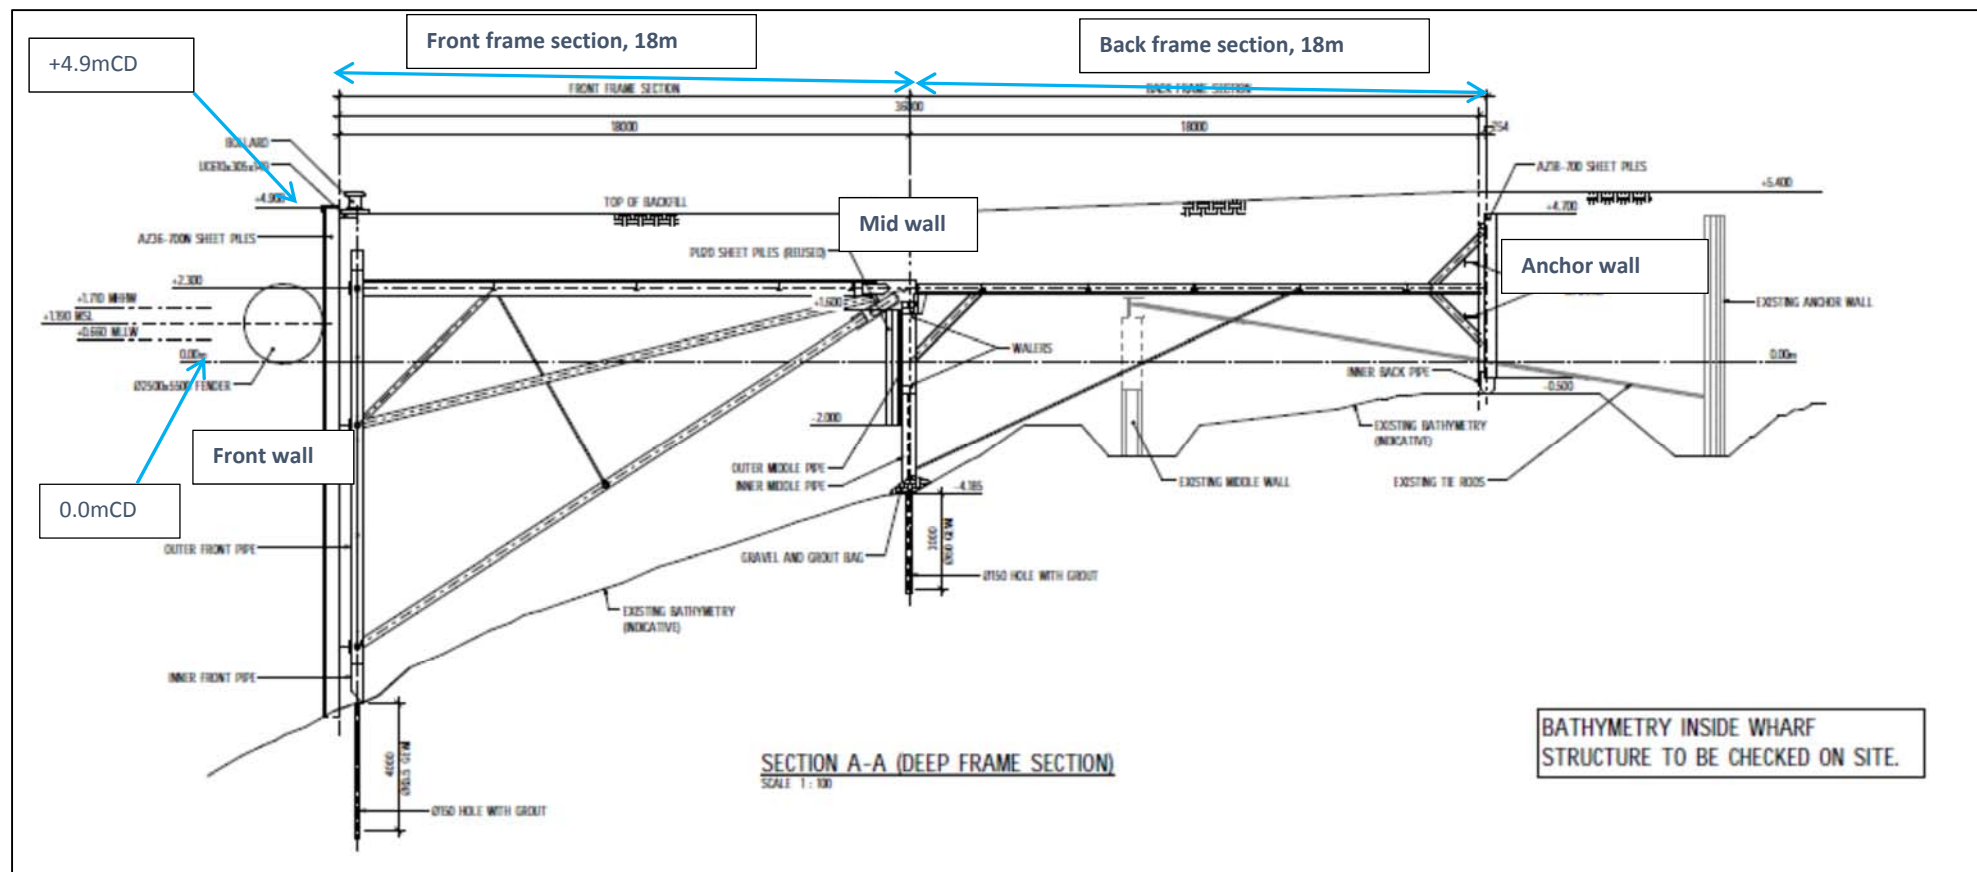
Deep Frame Section – Front to Anchor Wall
